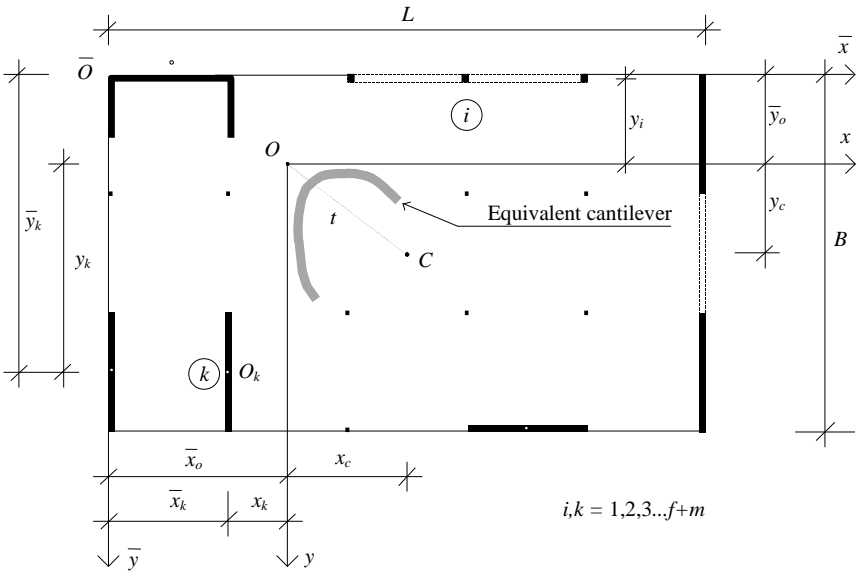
Typical layout with the equivalent column of open, thin-walled cross-section.
